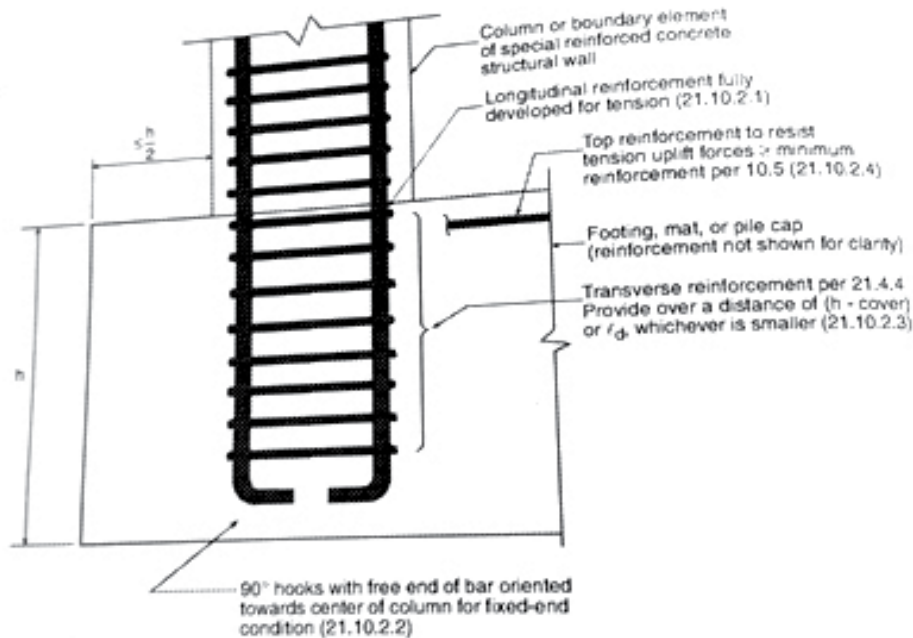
Reinforcement Details for Footings, Mats, and Pile Caps per 21.10.2
